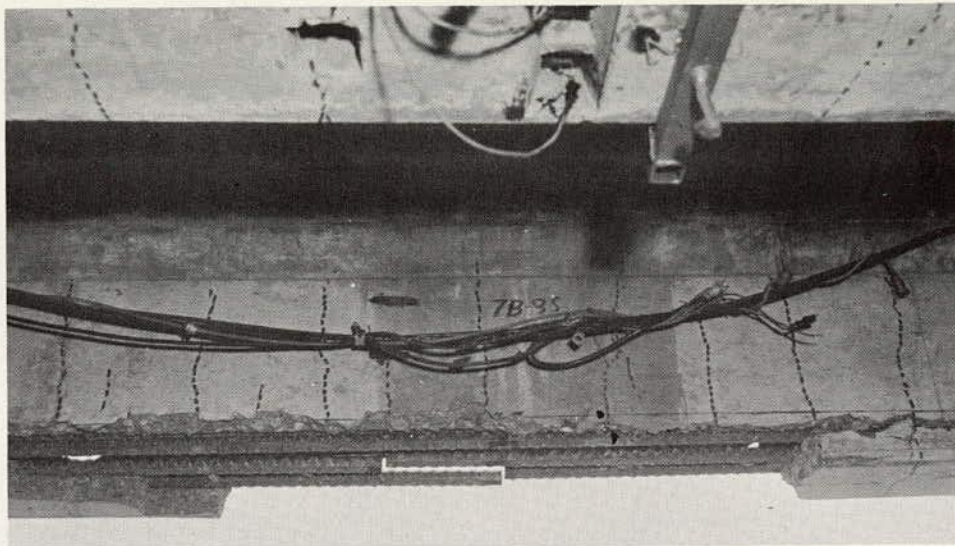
Fatigue failure of bars in Bridge 7B.
